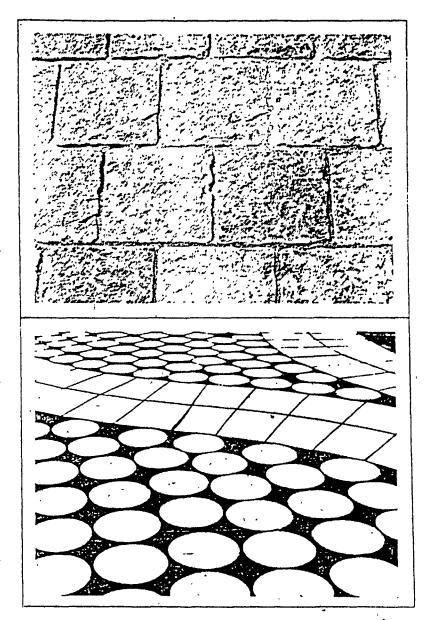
Floor Tiles imitating stone & Tries geometrically shaped for interior or exterior use
